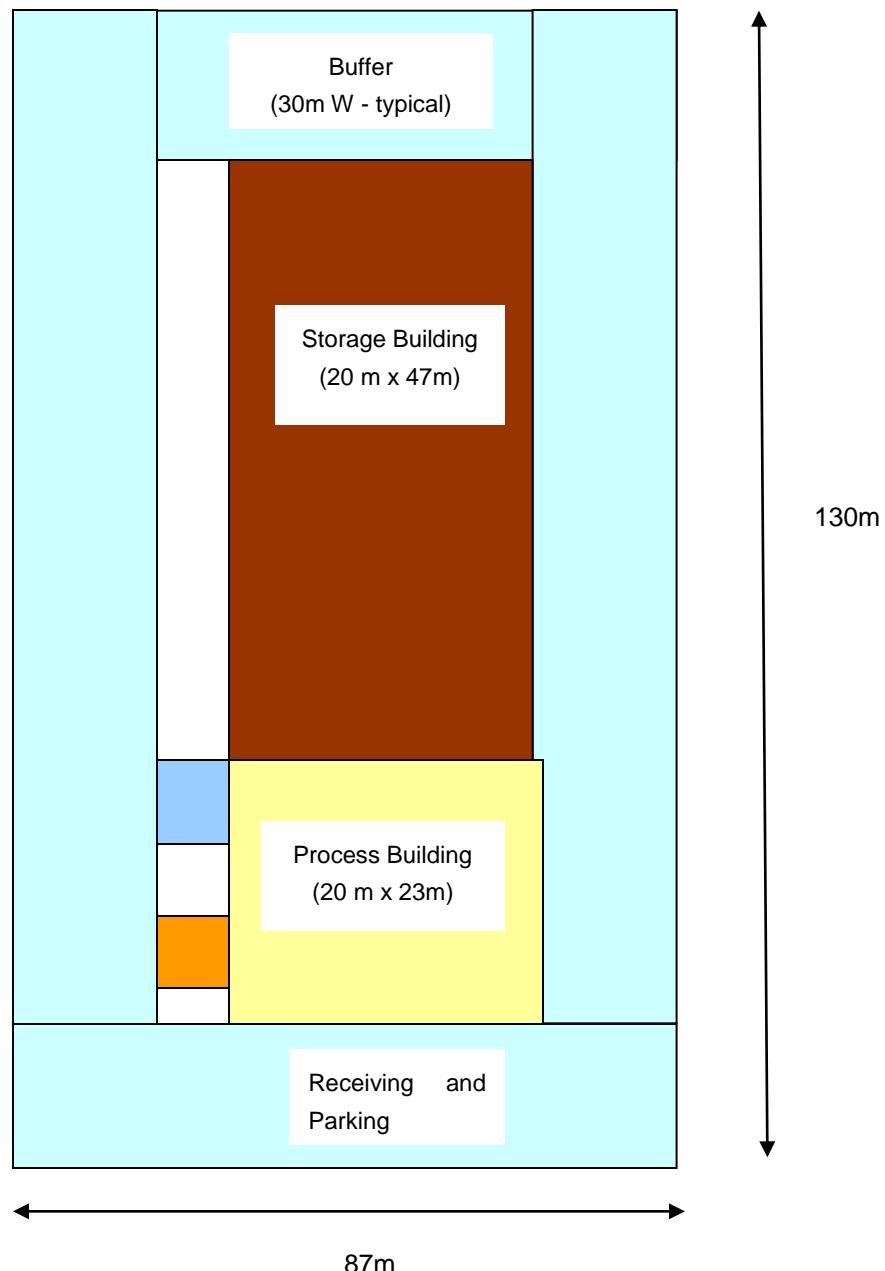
(c) Conceptual Site Plan of Alkaline Stabilization Facility
